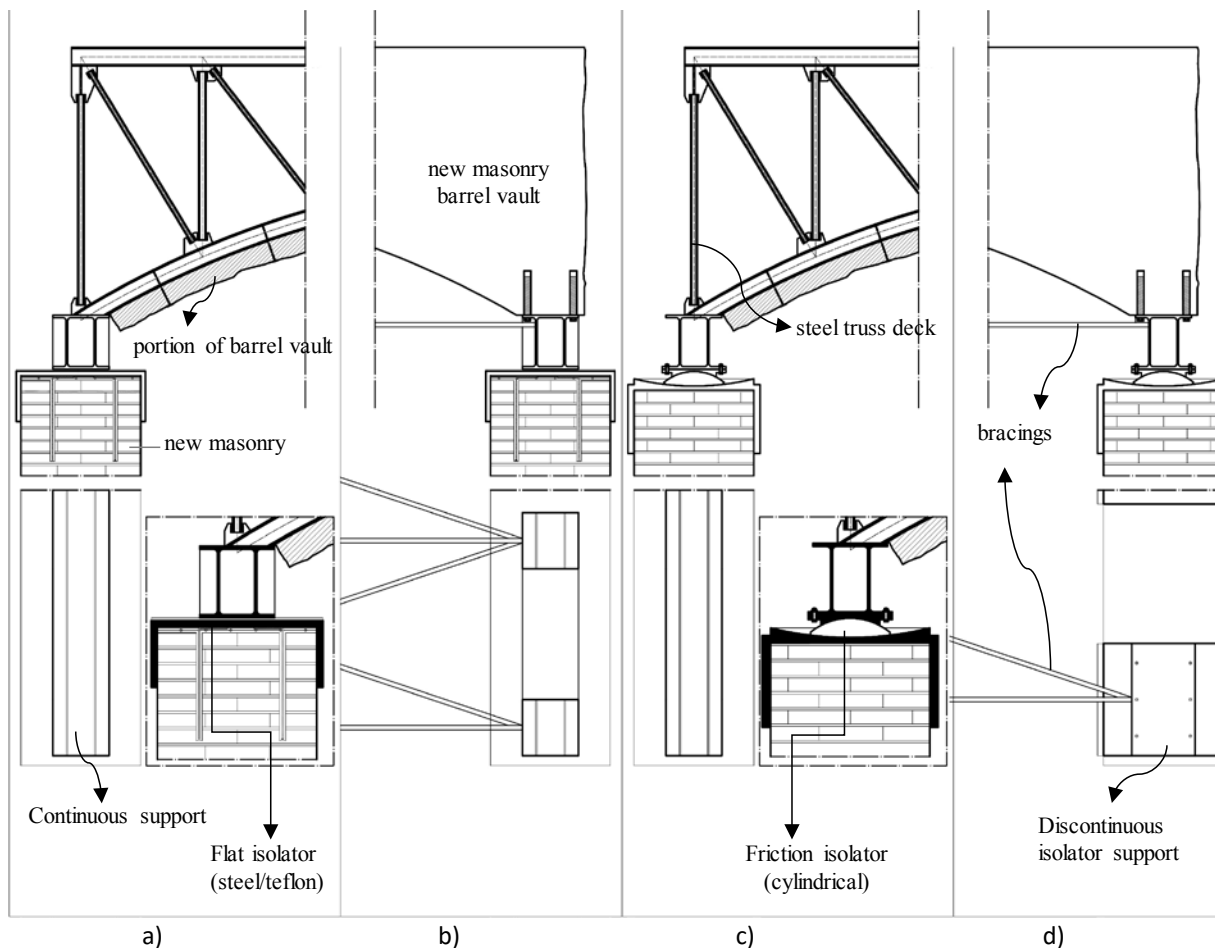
Frictional bearings' possible design solutions for both steel truss deck (left) and new masonry vault (right): a) long, and b) point-wise flat bearing, c) long and d) point-wise cylindrical SFP.
